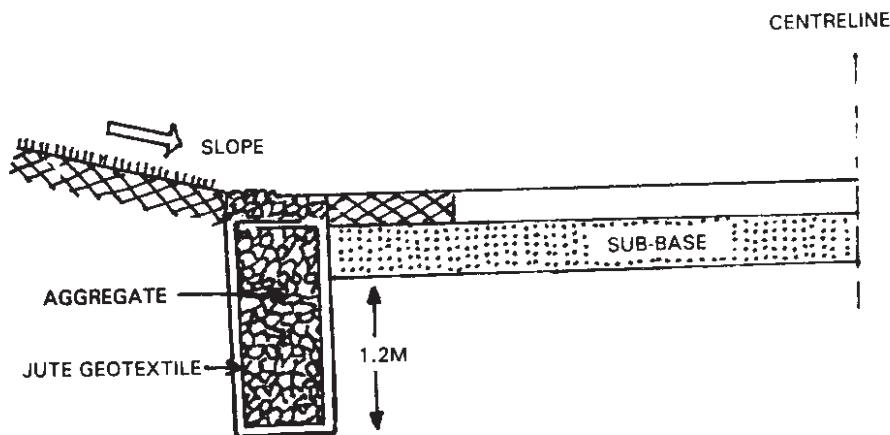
A TYPICAL HIGHWAY CROSS-SECTION WITH EDGE-DRAIN
